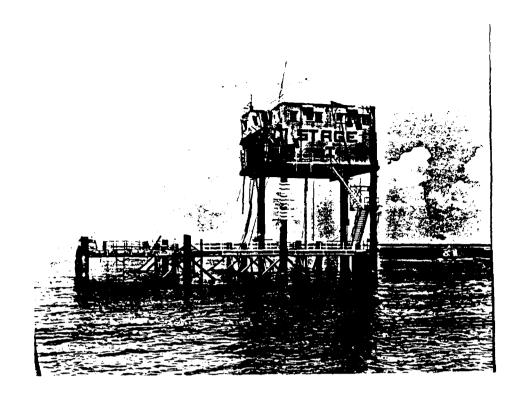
Unloading Section 2 (Stage I) on Materials Barge (Note that some sections were stacked double-decker and then welded together to save space)
